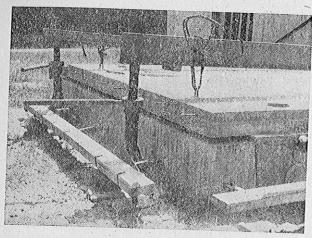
FLOOR SLAB RELEASED FROM PLATFORM
